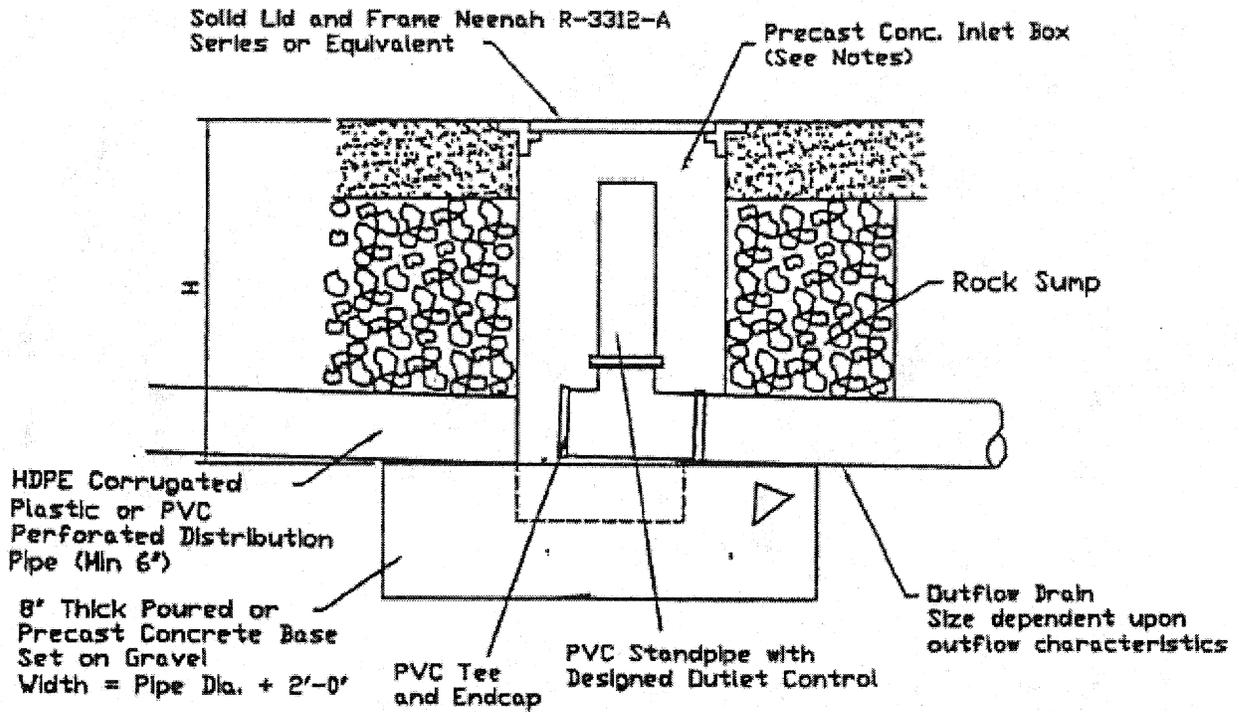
Rock Sump Detail (< 400 SF of impervious area)
